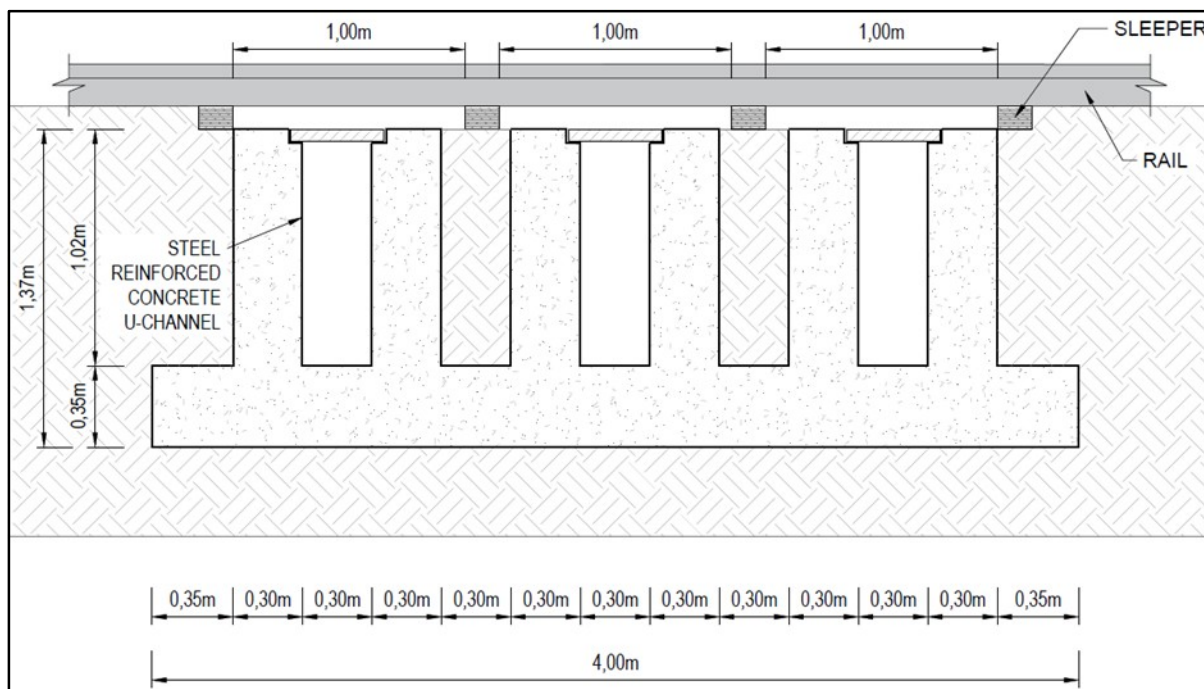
Section of proposed channels at railway crossing 2 between positions IAE SW3 and IAE SW4
